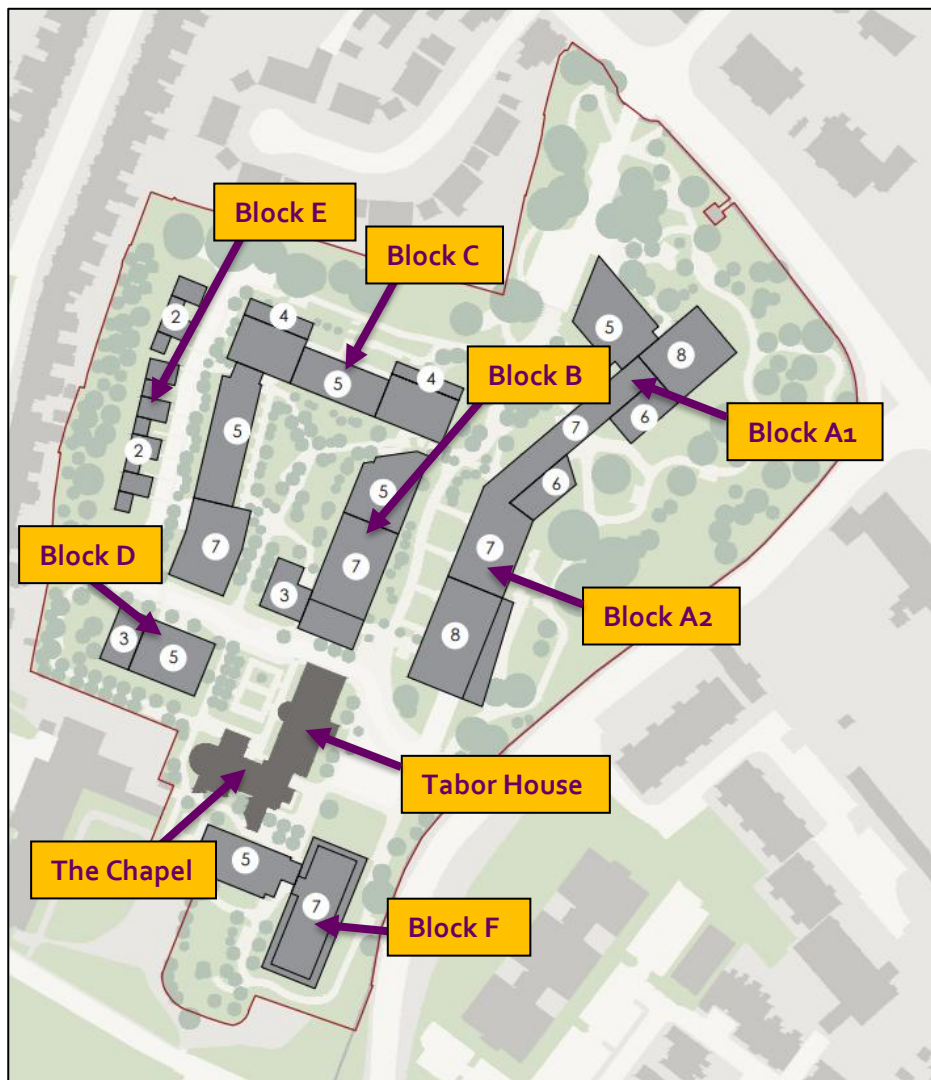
Proposed Layout of the Subject Development with the Heights Noted
